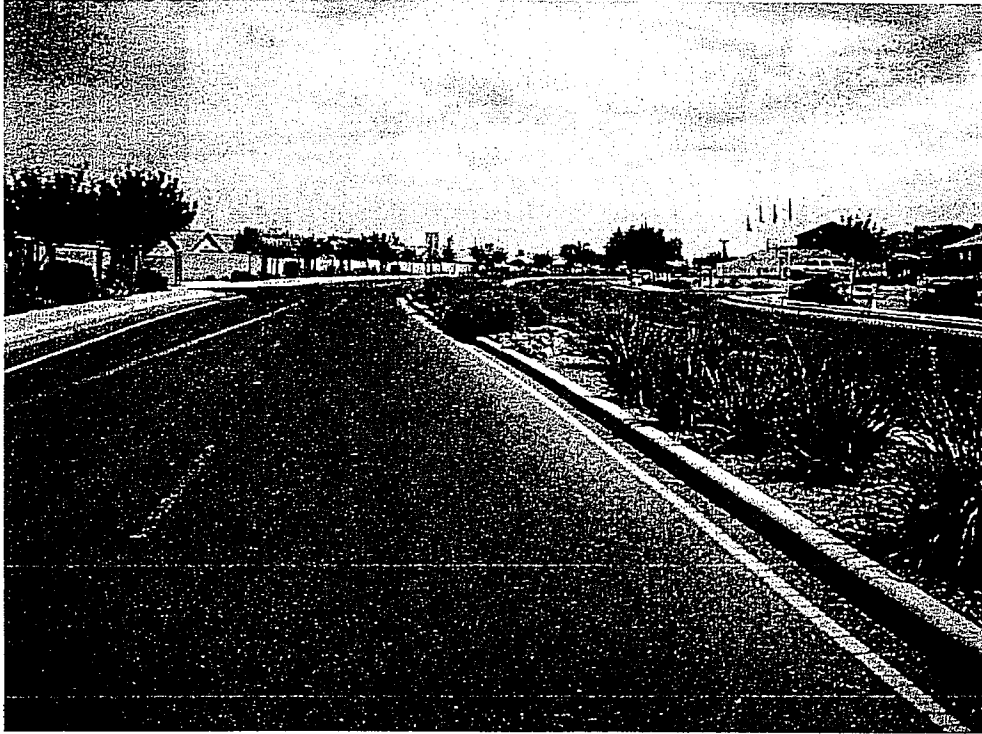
Street scene looking north on Eagle Crest Ranch boulevard
